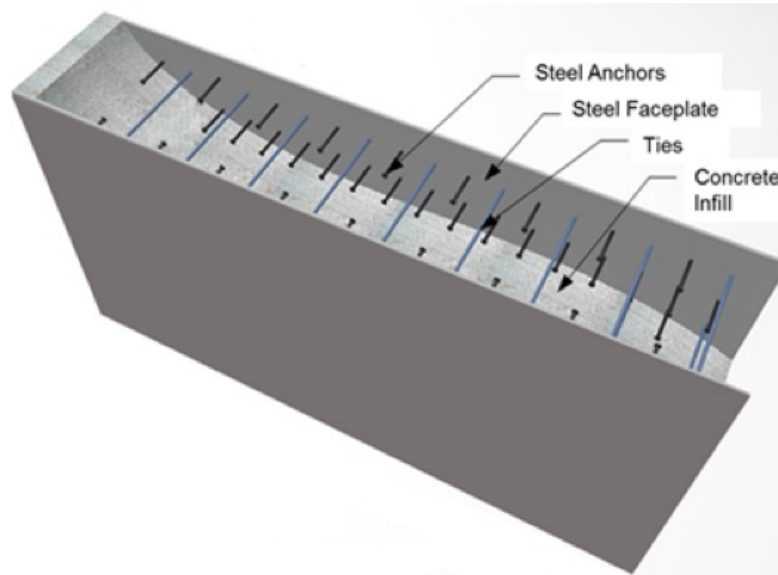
Details of a Composite Plate Shear Wall/Concrete Filled (C-PSW/CF)
